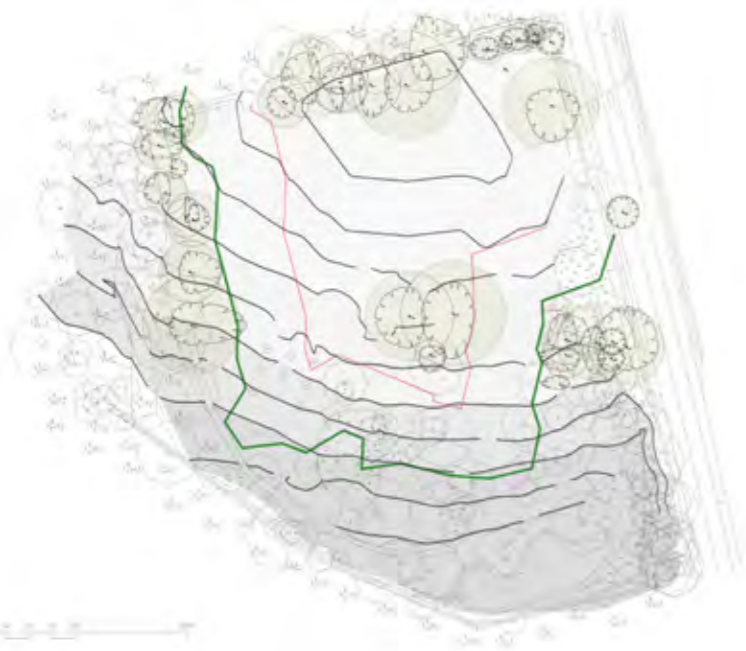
REINSTATING NATURAL SITE TOPOGRAPHY
